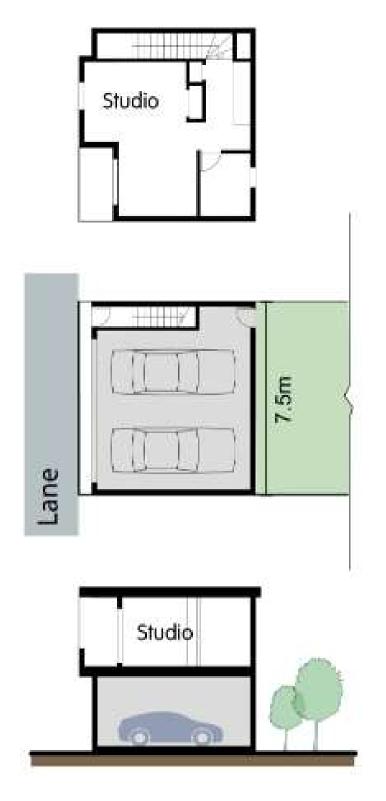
Typical Studio Dwelling Typology with Two Parking for Terrace Only
